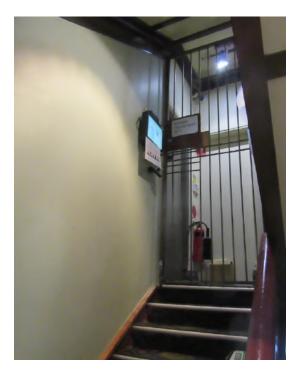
Stairhall G.03, looking up towards the entrance to office 1.36. The battened stair soffits are original. Source: TKD Architects 2020.
